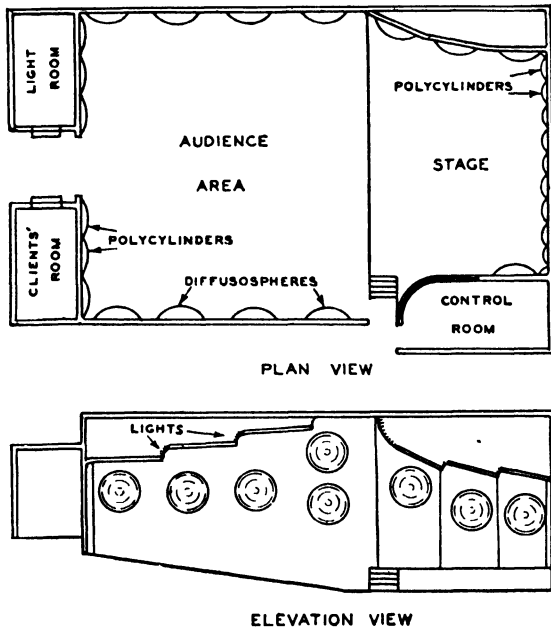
Plan and elevation views of an auditorium type broadcasting studio. (After Nixon and Nygren.)
